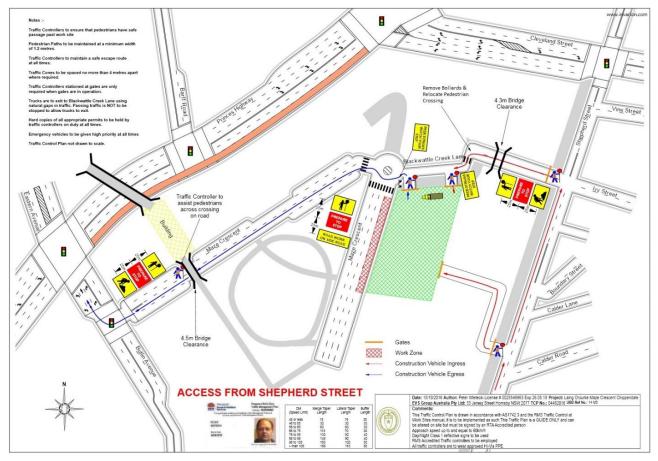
Draft traffic control plan for the ETP Stage 1 works
